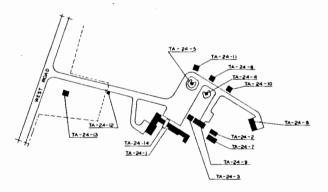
Structure Location Plan for TA-24 - T Site (1950 Drawing from the LANL Technical Area Structure Location Plans)
